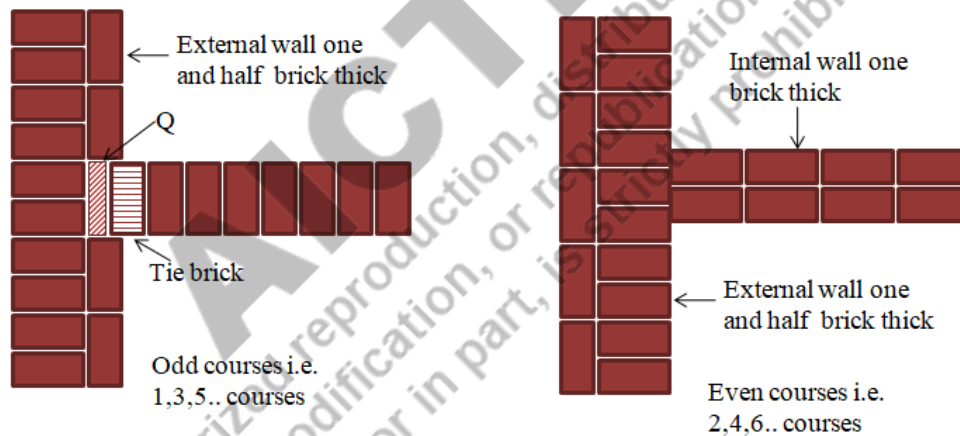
(b) Tee-junction between one and a half brick thick wall and one brick thick wall
